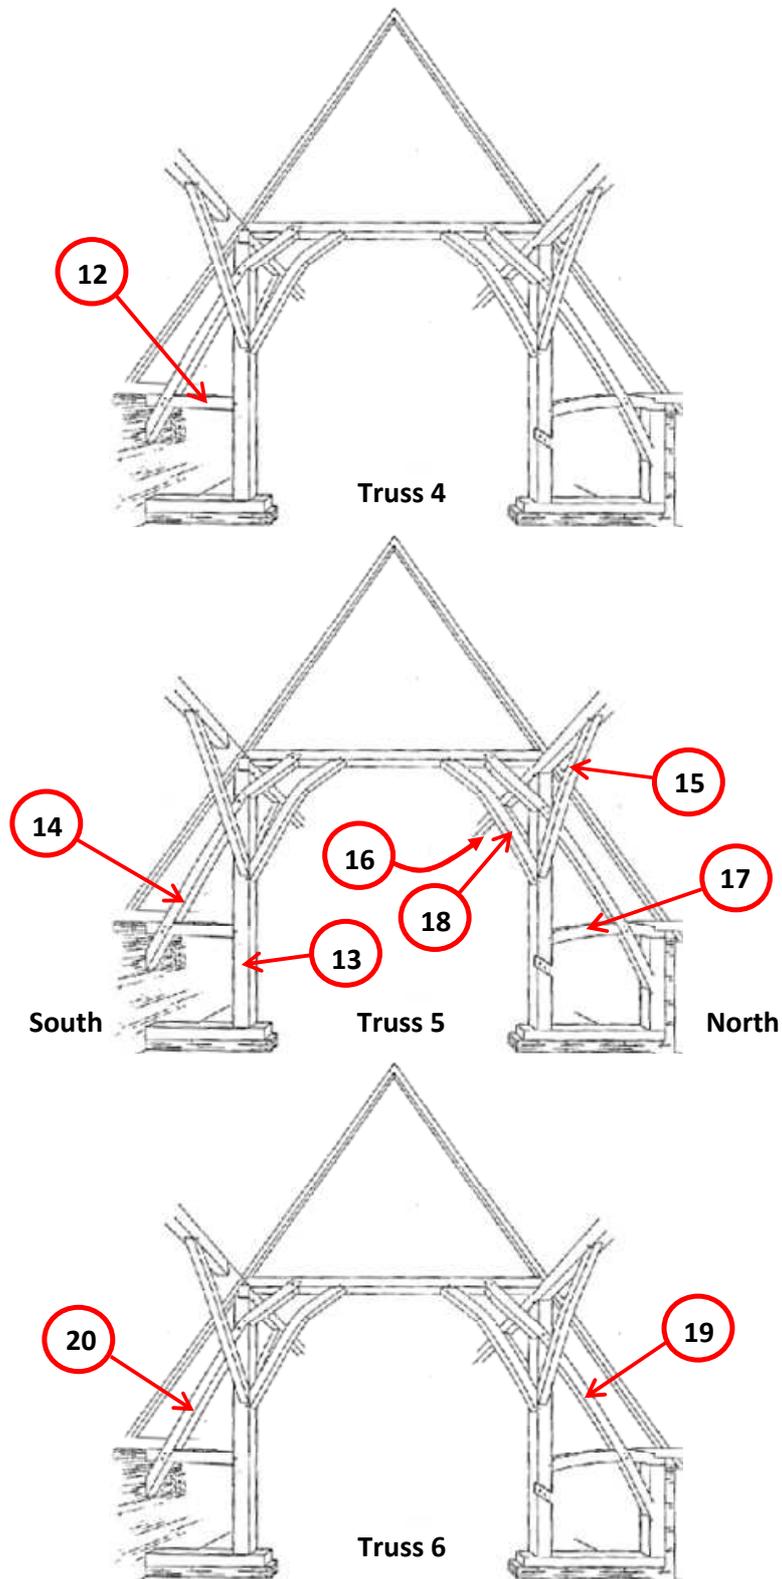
f: Cross-section through the trusses to help locate sampled timbers, viewed from the east looking west (after John Walker)
